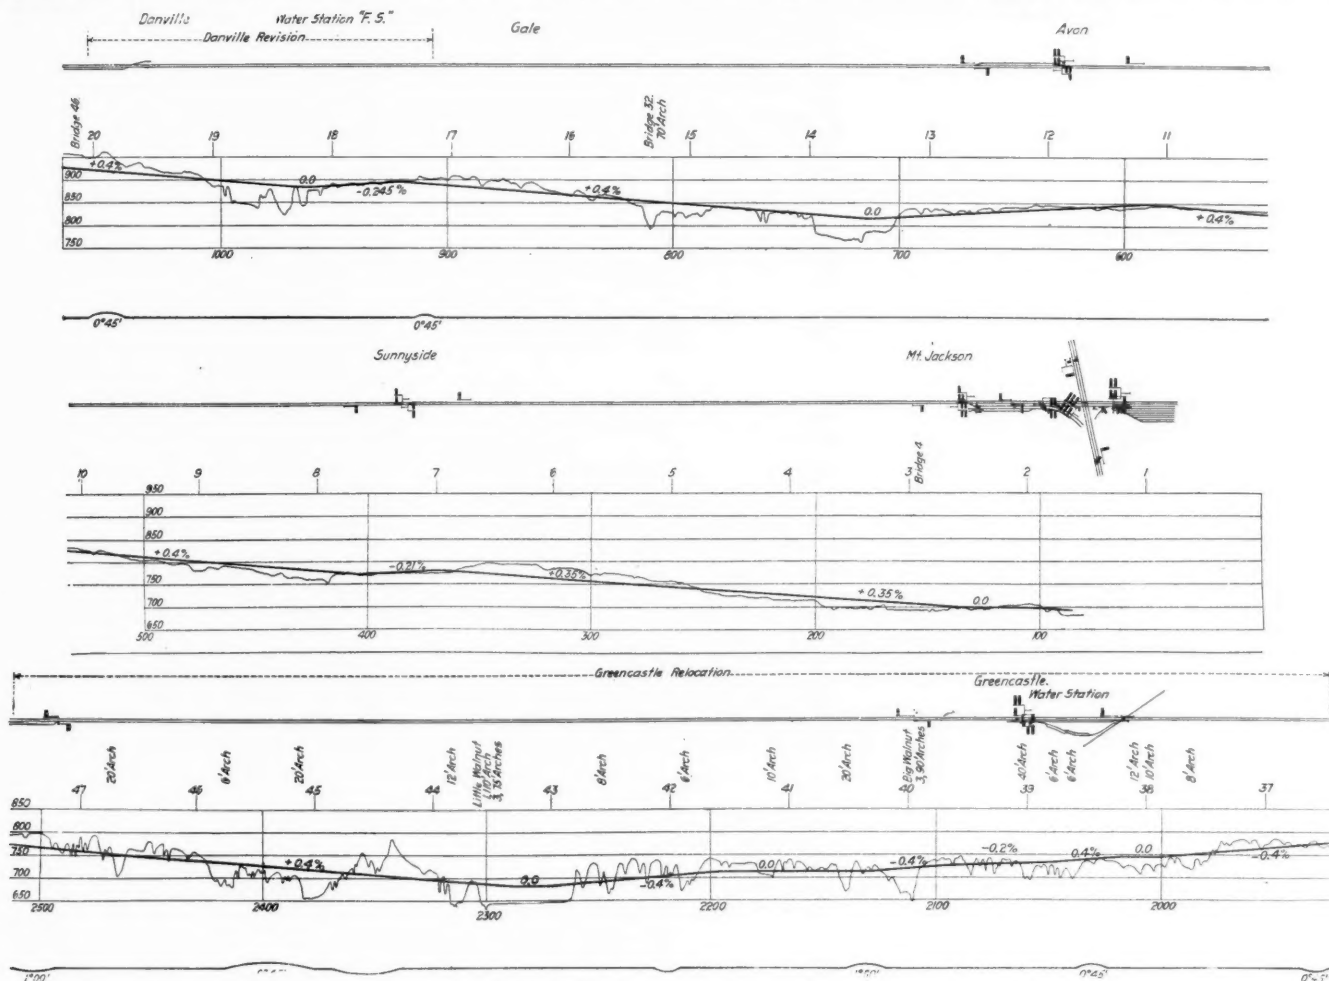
Plans and Profiles of Sections of St. Louis Division Reconstruction.
